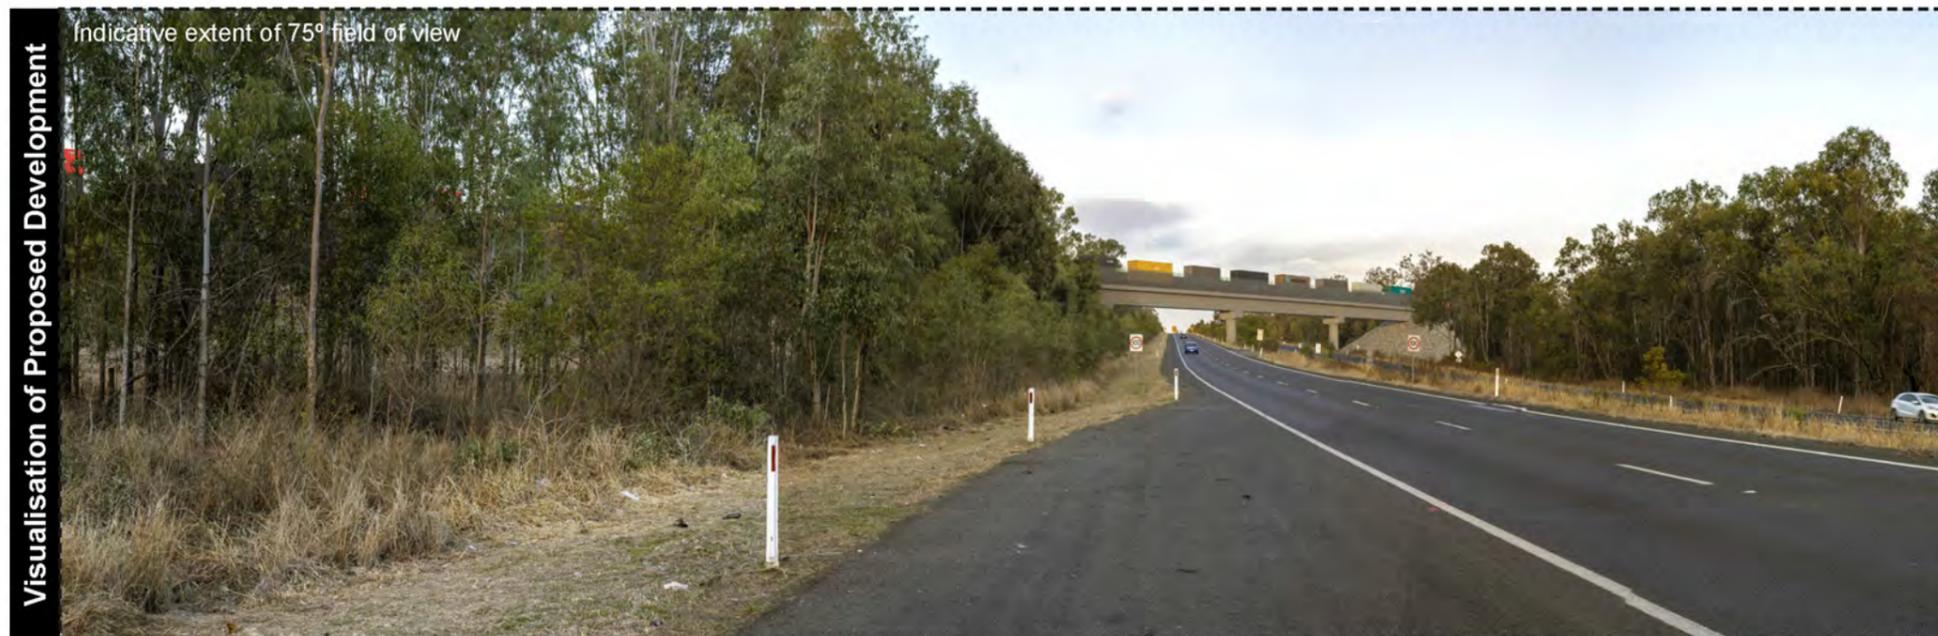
Viewpoint 4: Beavan Street looking southwest towards existing Lockyer Creek rail bridge
